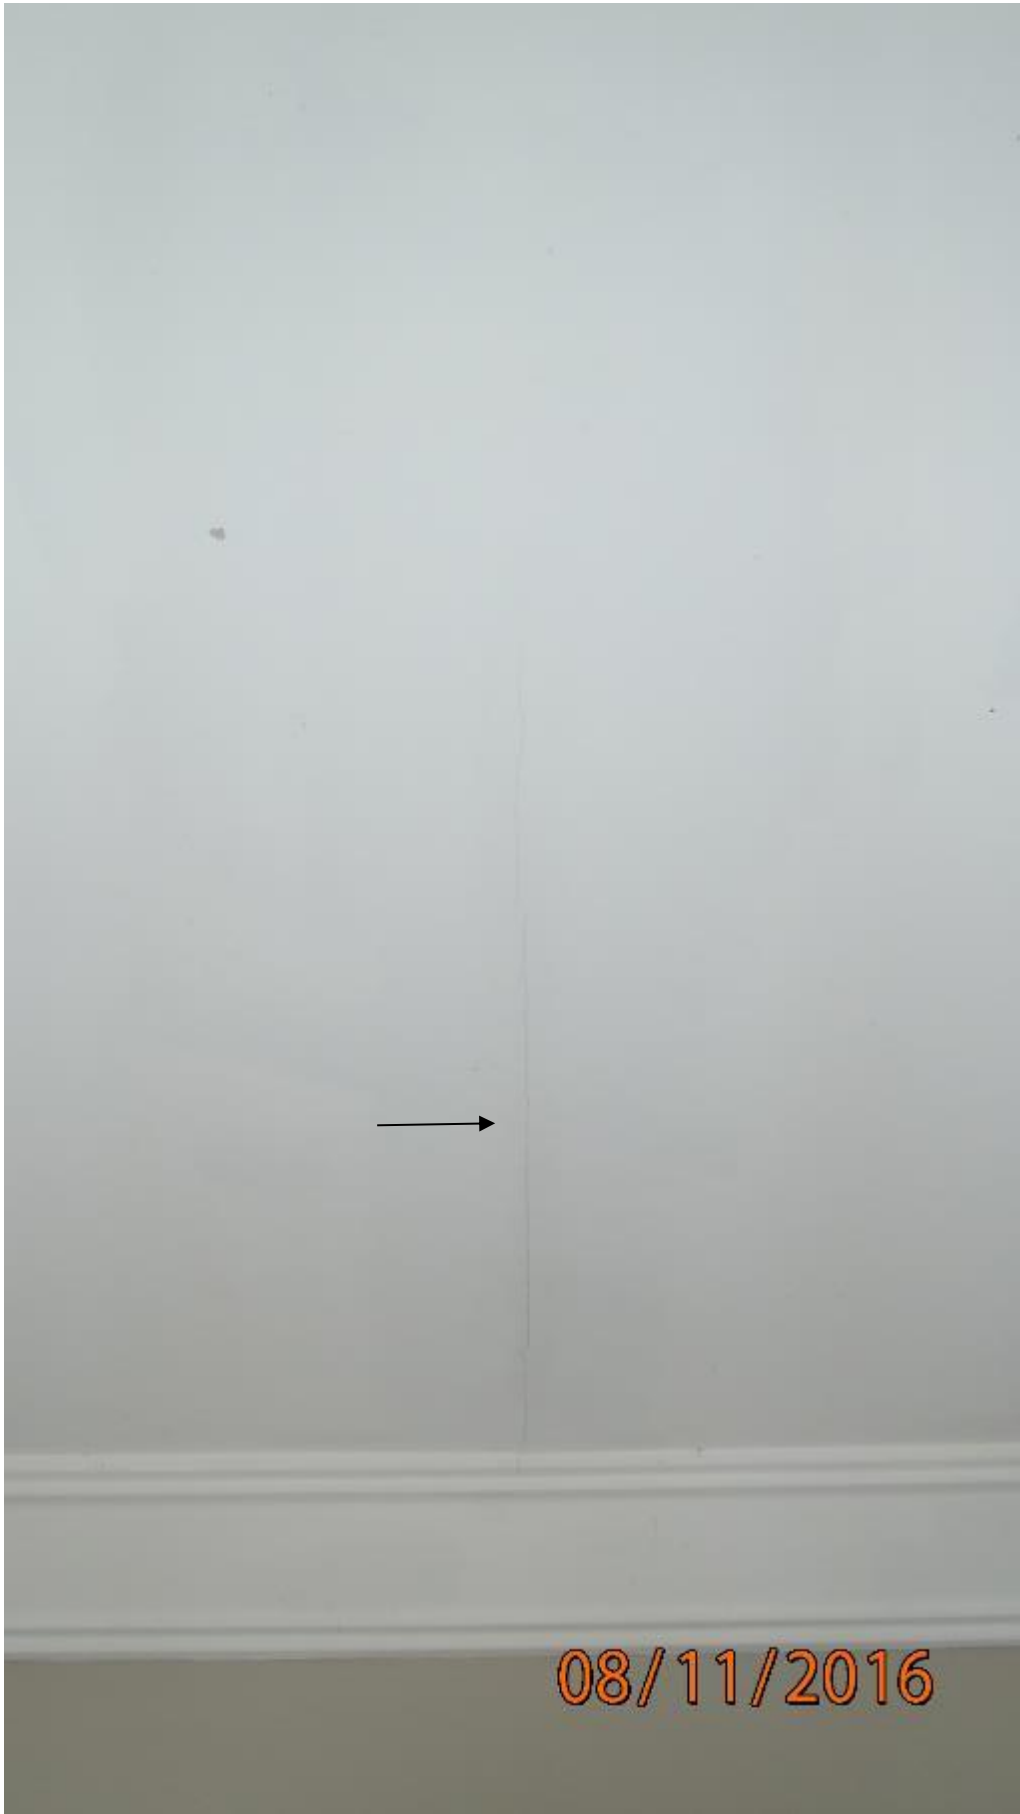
shows displacement of the securers to the plaster ceiling in the Kitchen.
